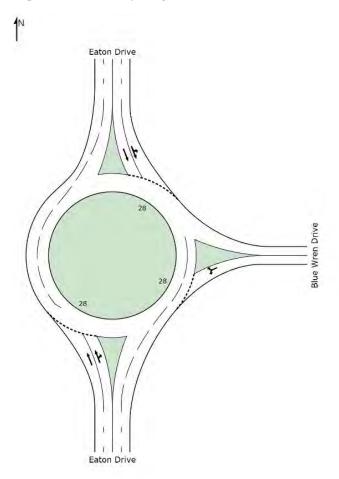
Concept Layout for the Eaton Drive / Blue Wren Drive Intersection
